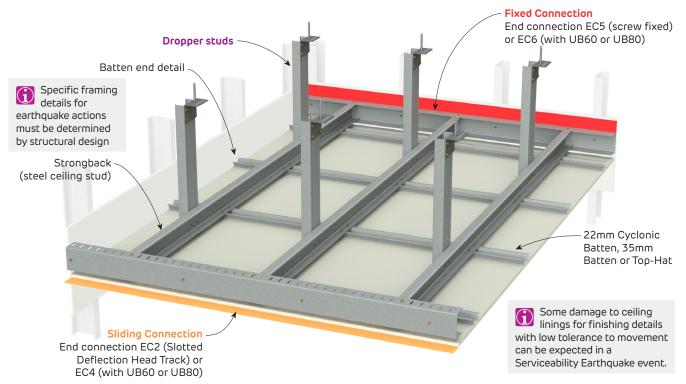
Stud Ceiling Type A3 - Fixed / SlidingOne side Fixed and the opposite side SlidingPerspective
